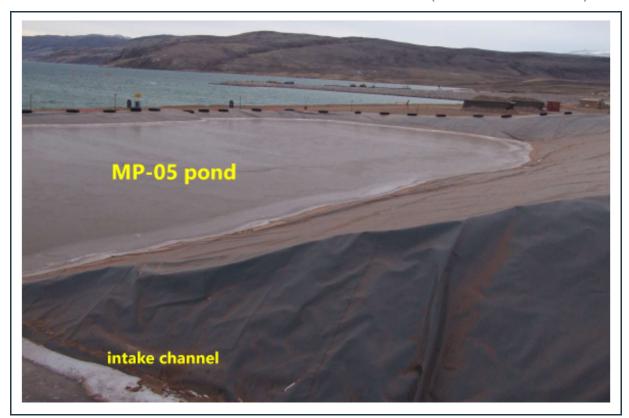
View of the MP-05 pond, adjacent to the north-east corner of the ore stockpile.
